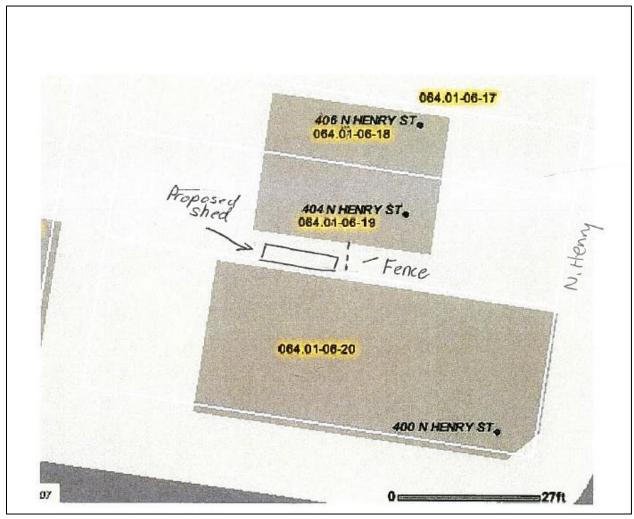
Location of proposed shed. The shed, as installed, sits closer to the front façade of 404 N. Henry Street than shown here.
